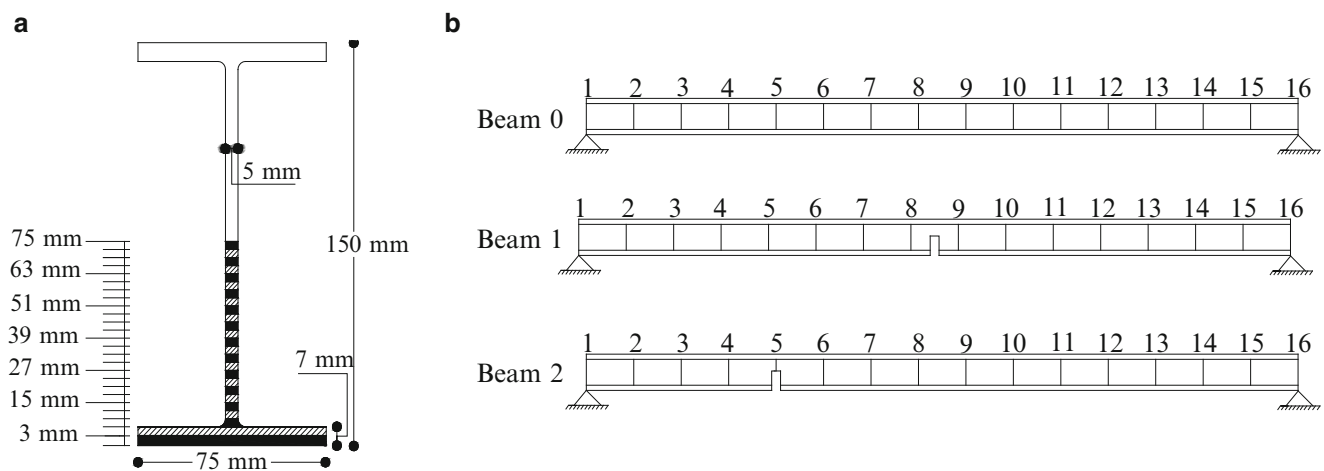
I-beam damage scenario: (a) dimension and damage depth of beams; (b) damage location of beams
